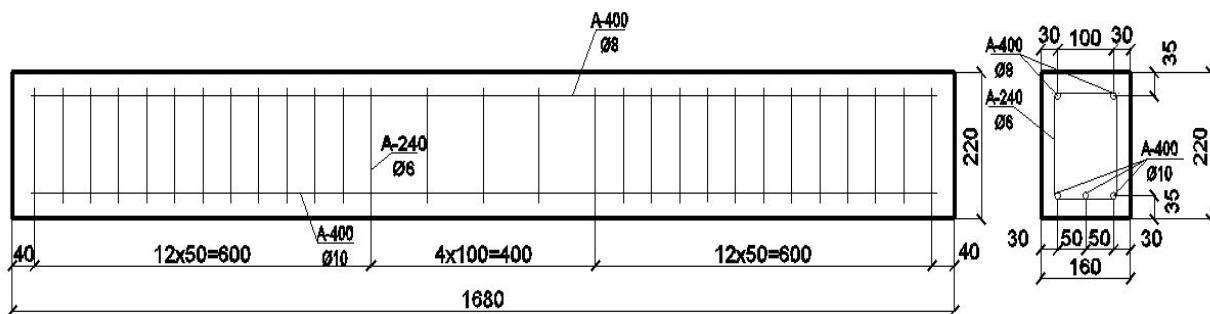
Reinforcement scheme for a reinforced concrete laboratory sample (Ящук, 2017a; Ящук, 2017b)
